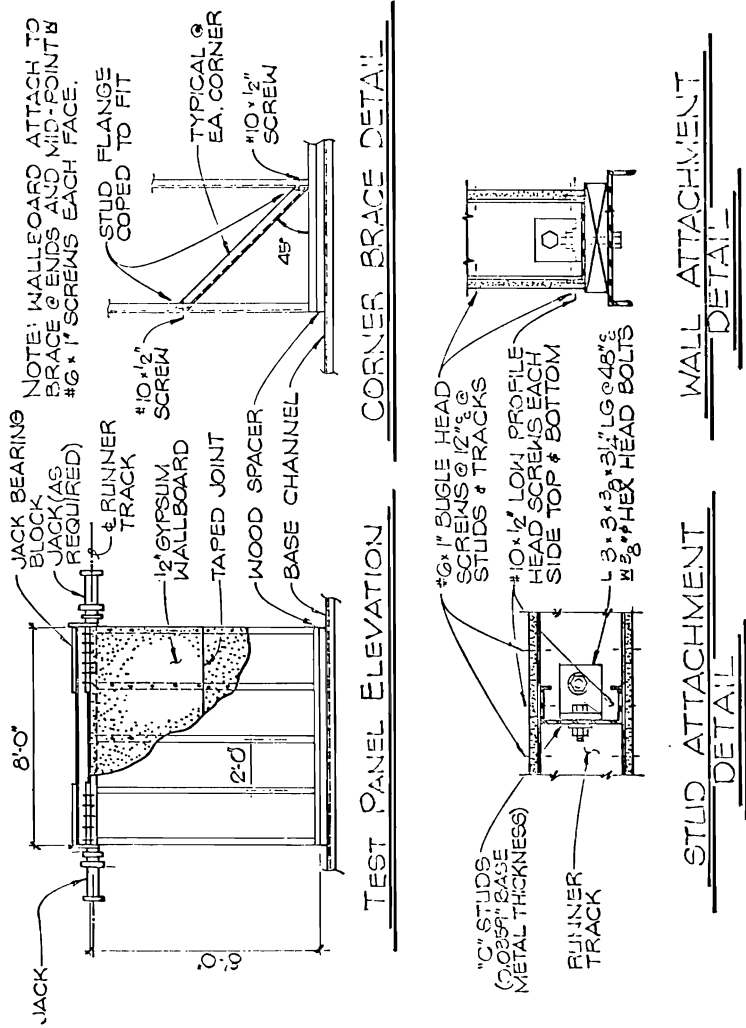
Test Assembly Plan & Details - Wall Type "F"
